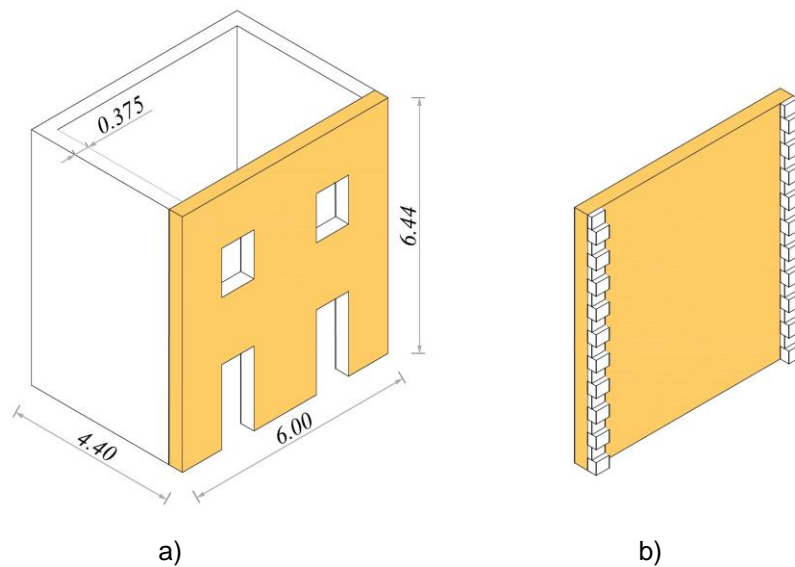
Geometrical model of the two-storey case study building. a) Units in m; b) front wall without openings but with indentations with the side walls.
